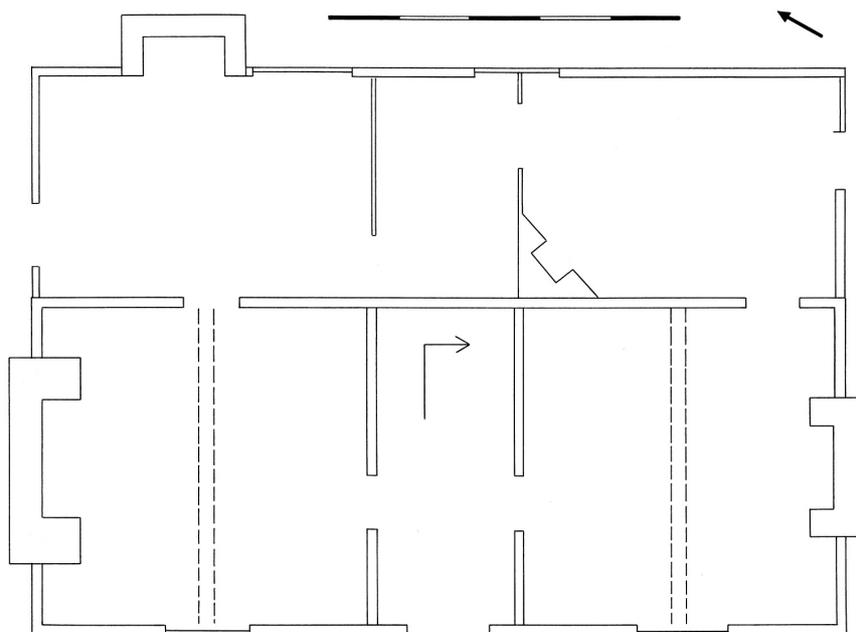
The farmhouse. Ground-plan showing positions of chimneys, windows and doors, together with the central stair opposite the entrance lobby.
